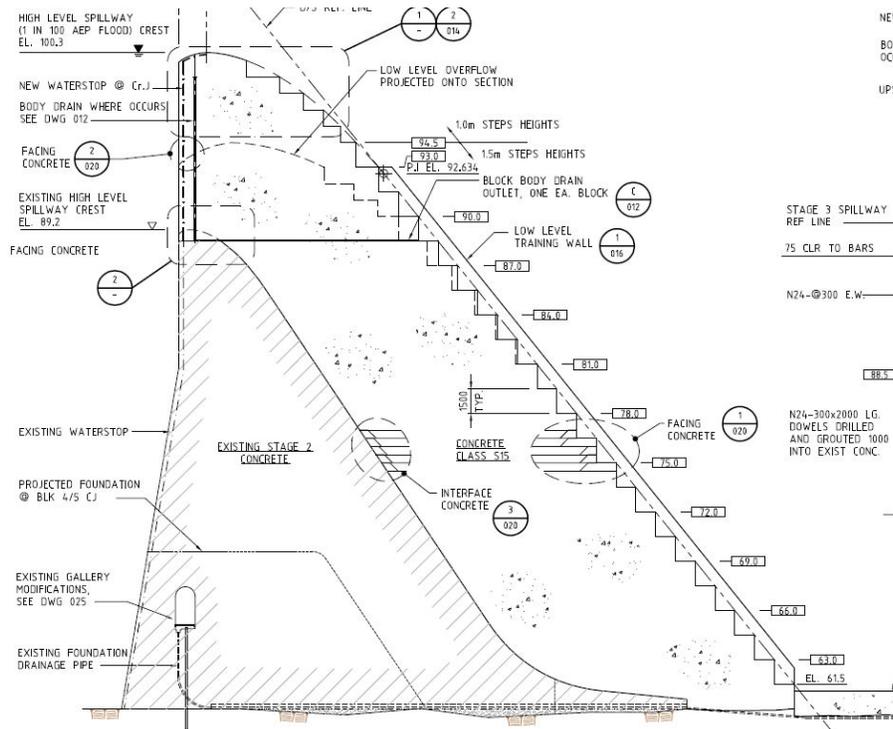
Stage 3 Spillway Raise High Level Spillway Monolith
